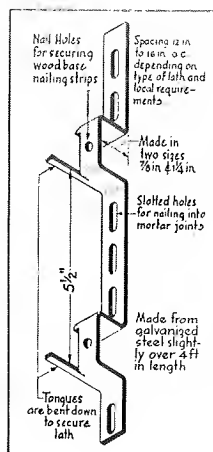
(RIGHT) Adjustable Anchor and Wall-Furring (Patented) System for Masonry Walls Designed to Prevent Condensation from Dampening Furred Plaster, V-shaped Horizontal Furring with Special Clips, etc. Used on Rockefeller Center Buildings, etc.
